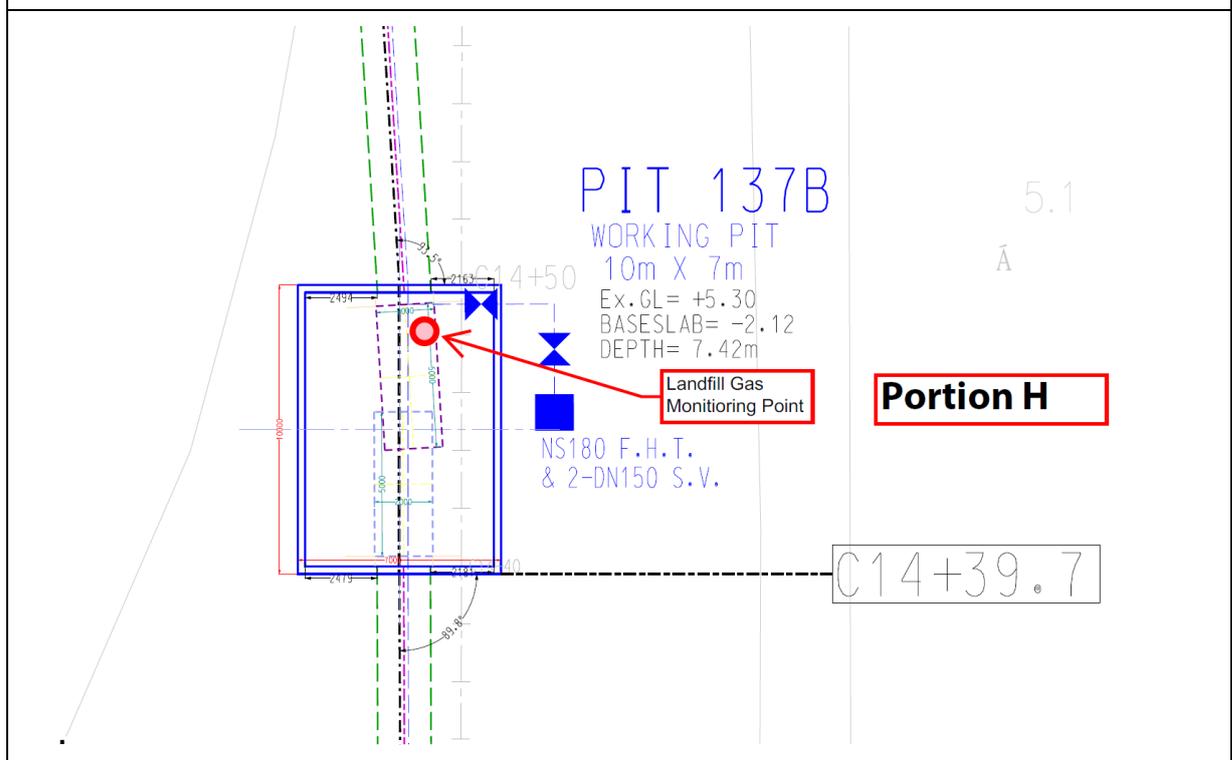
Monitoring Location - Pit 137B (137 Pit B)
